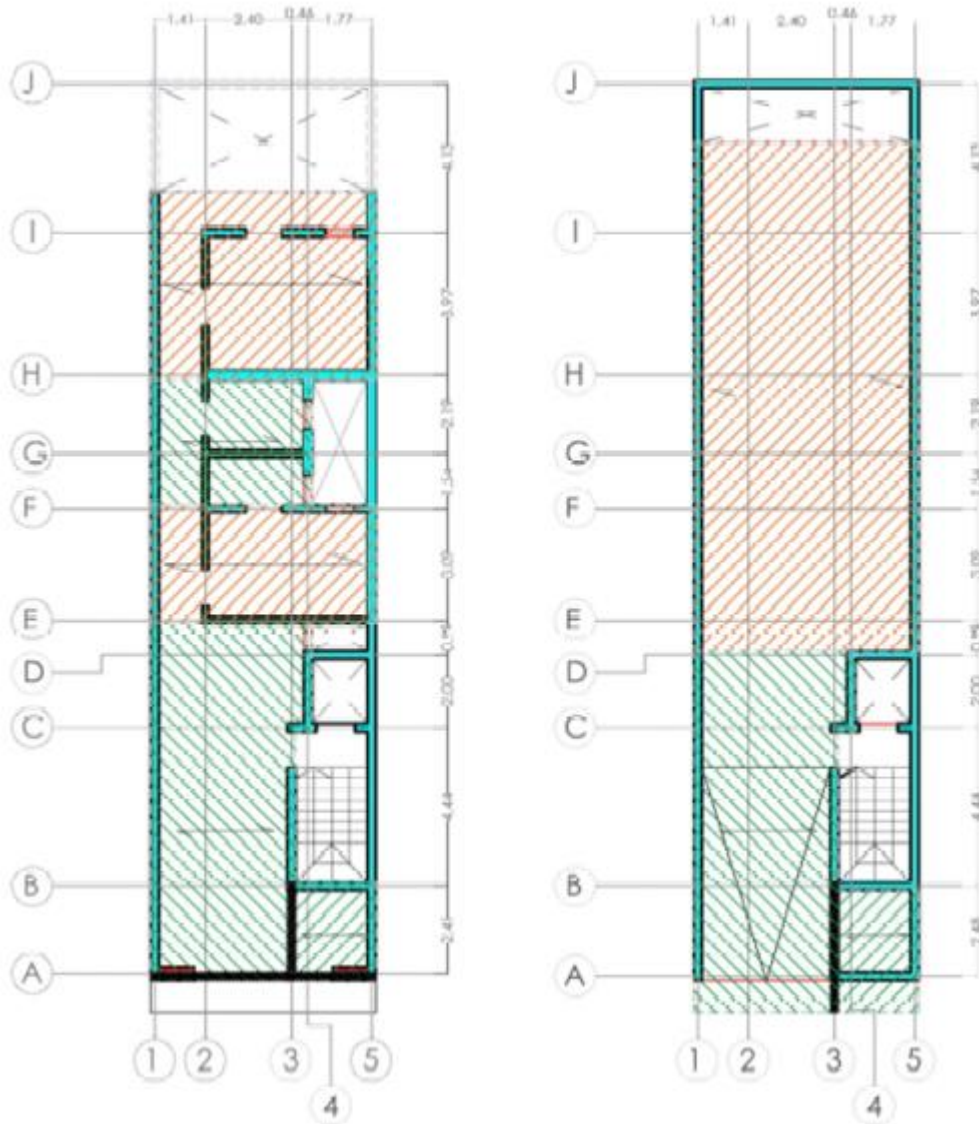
Standard layout for a residential building following a 1:4 plan ratio. Source: Borg (2021)
